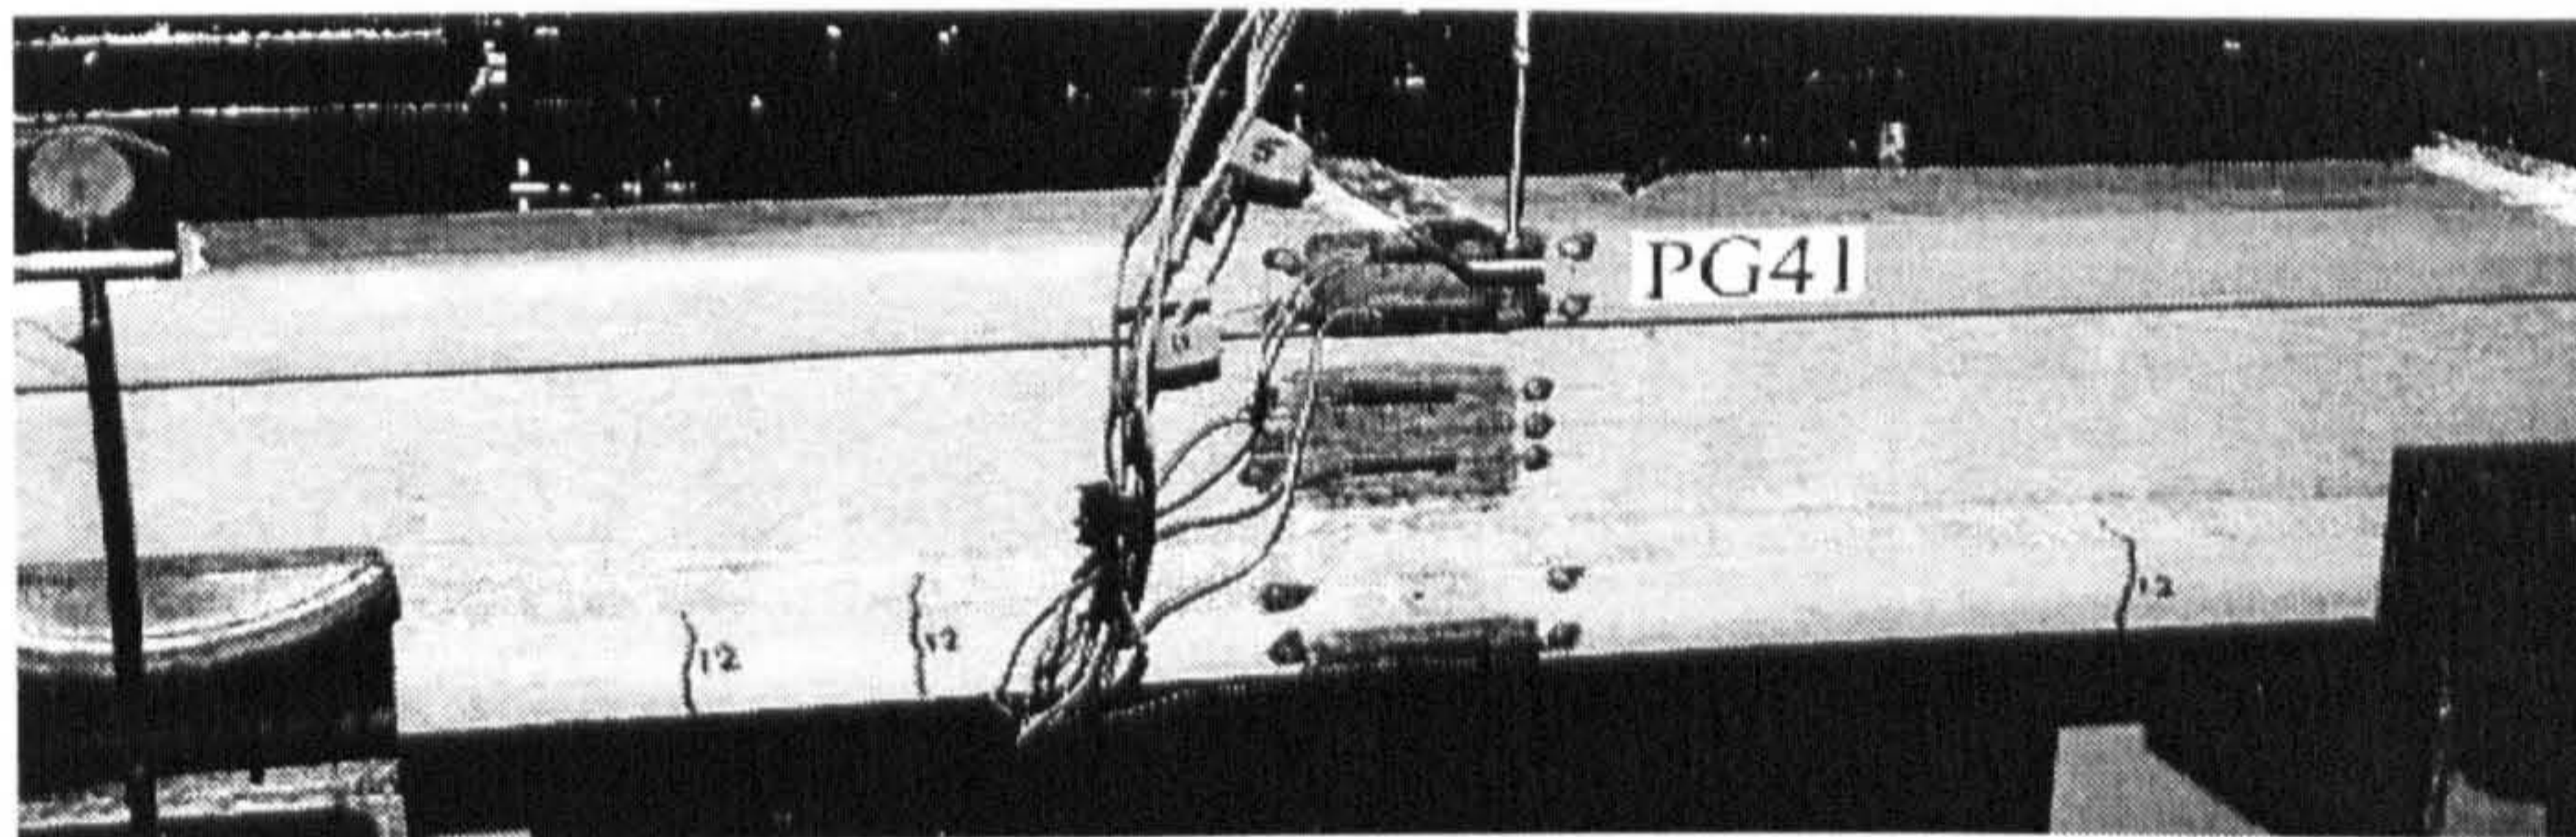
Cracks pattern of beams PG41 & PG42 before external prestressing
